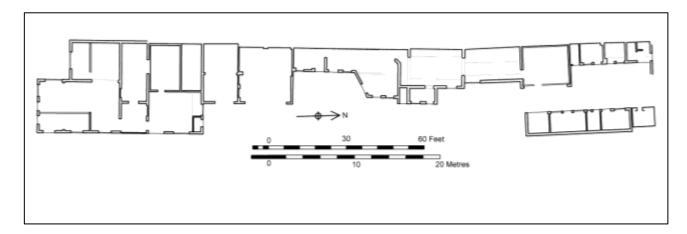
Plan of outbuildings to rear of No.s 8-10 Market Street, Ashby.
